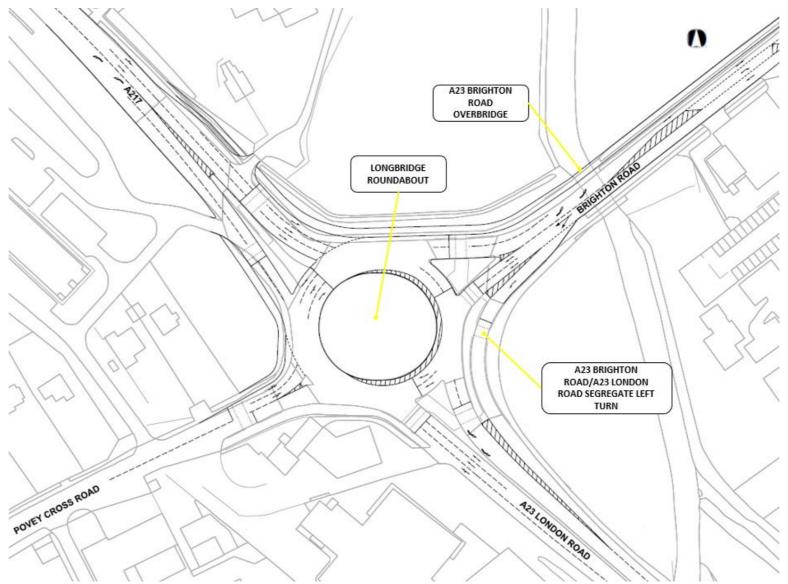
Longbridge Junction Signal-Controlled Roundabout Concept Layout
